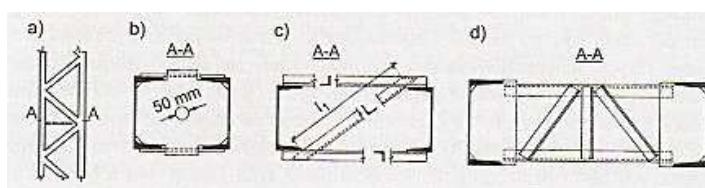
Examples of solid and built-up columns' cross-sections
